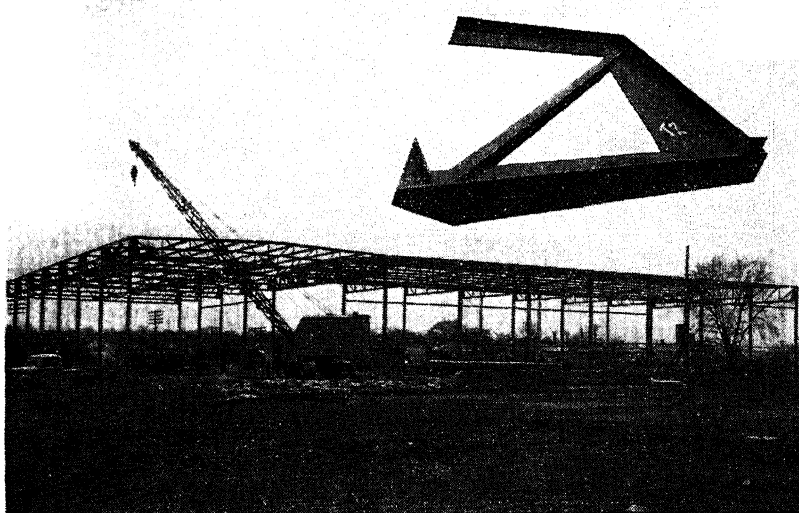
A one-story welded mill building 126 ft. long, 50 ft. wide, in "L" shape. All steel fabricated at erection site. Top and bottom cords for struts made by splitting a wide flange beam. Web system consists of angles welded to small T's, eliminating gusset plates. (See inset.) Weight saving over riveted construction 20%. Only equipment required for complete fabrication and erection was punch, shear, cutting torch and arc welding equipment.
